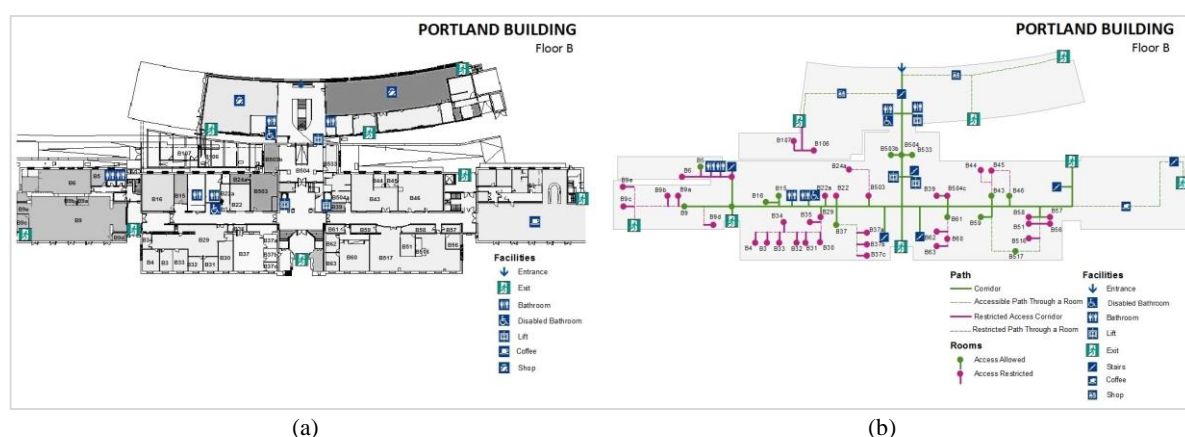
Portland Building: (a) floor plan; (b) schematic map
